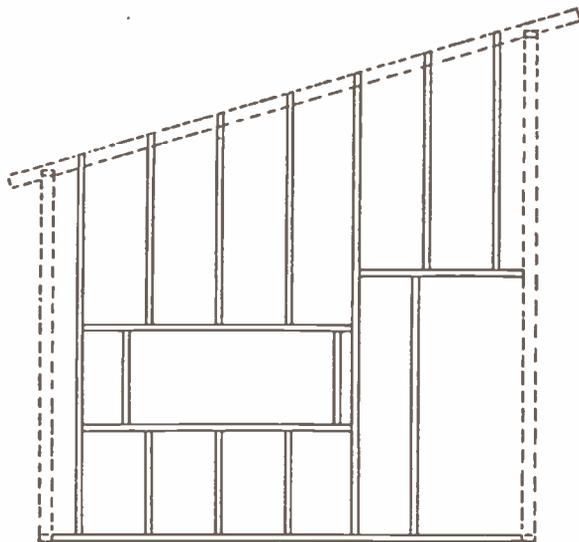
Arrangement of Framing for Rear Kitchen Wall.
